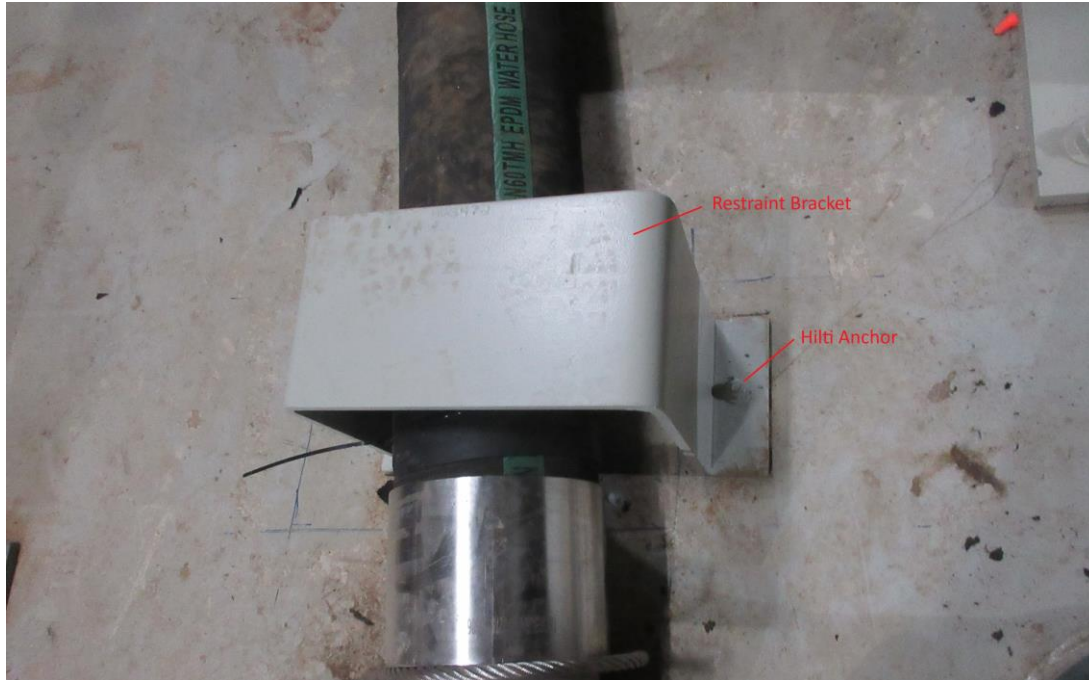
Figure showing TREWS piping with restraint bracket and anchor
